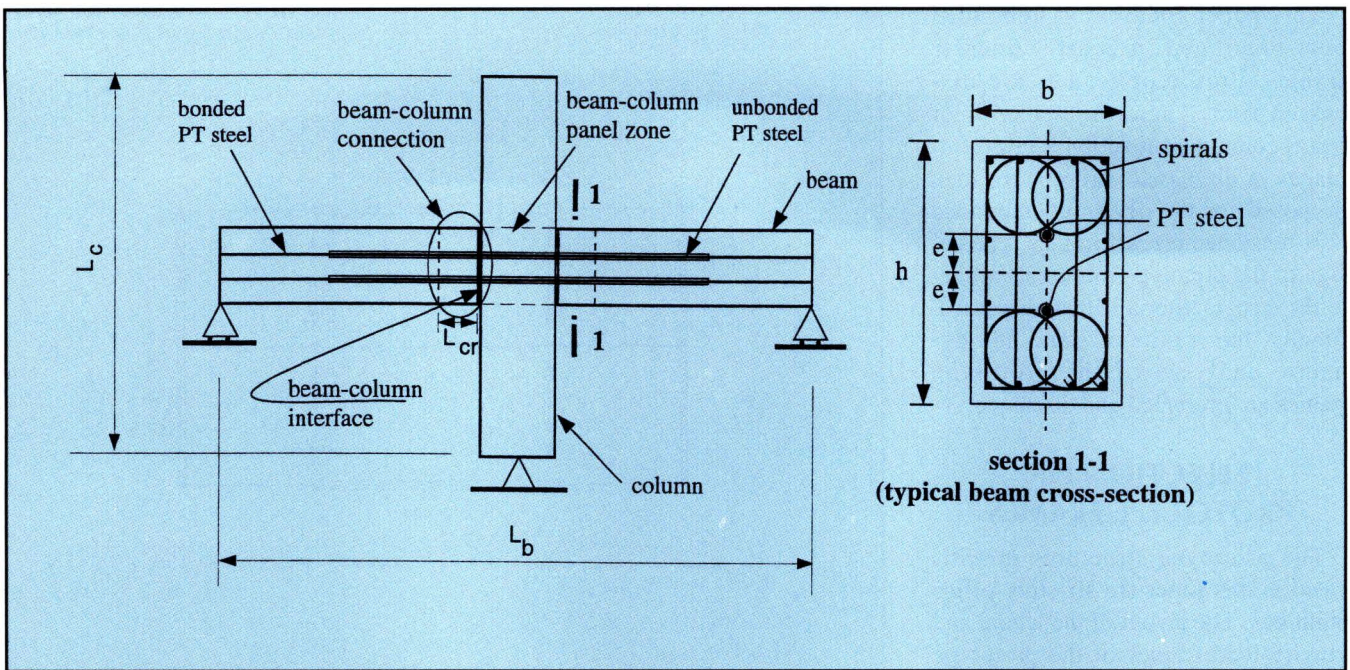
Unbonded post-tensioned precast beam-column subassembly.
